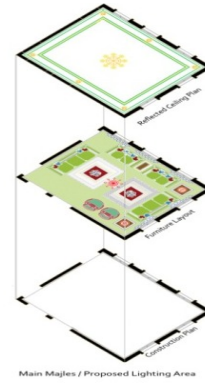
Main majlis plan, furniture layout, and Reflecting Ceiling (GF)
